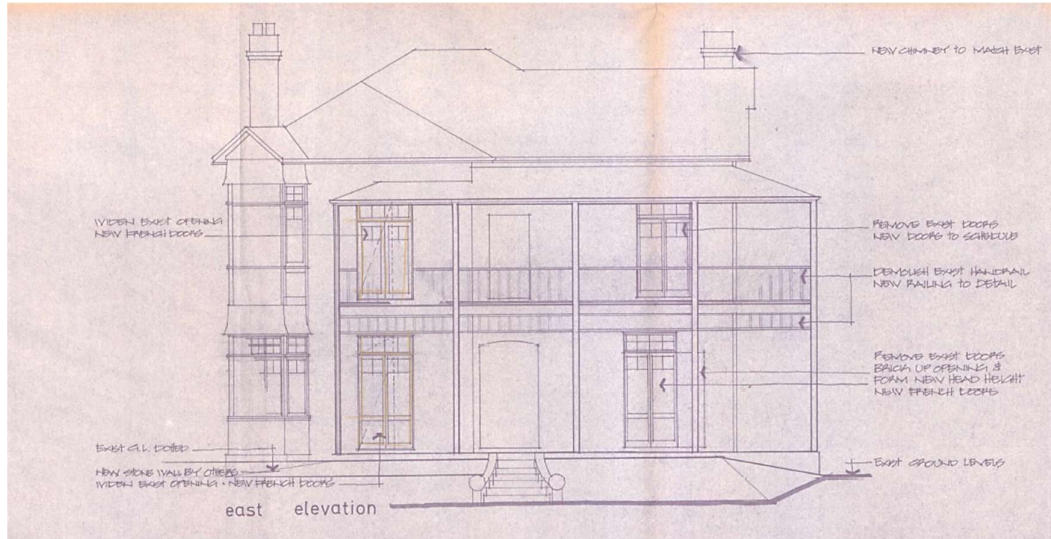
Approved plans 1983 plans showing the layout of the house and proposed works.
